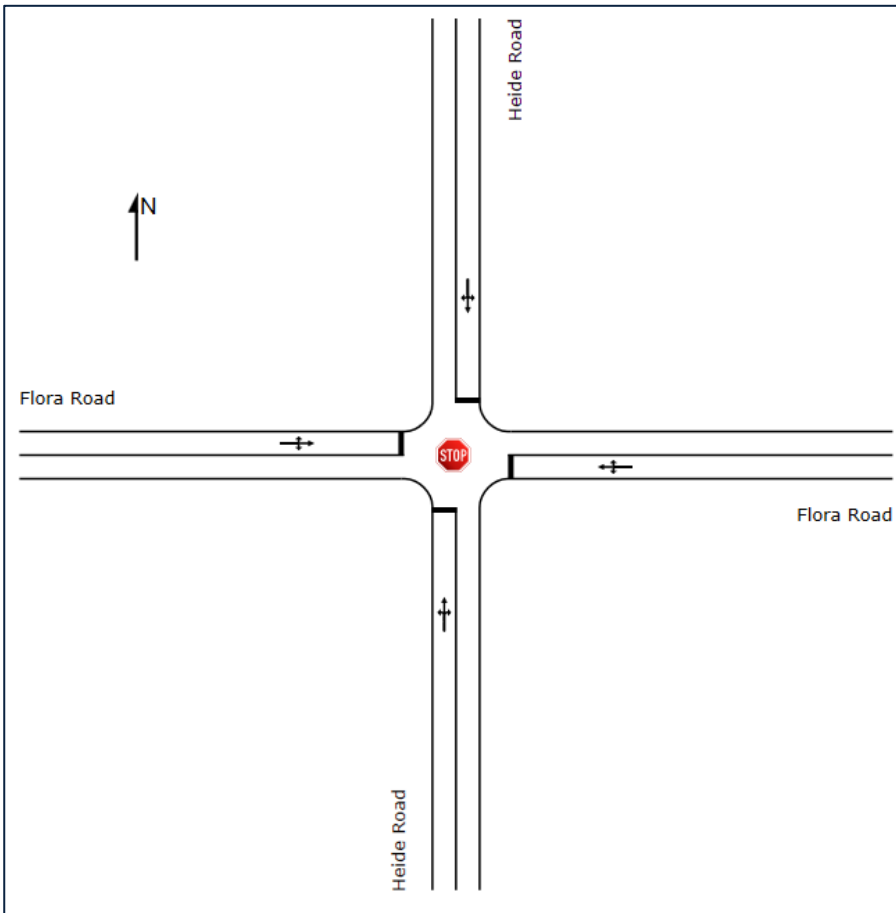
Existing Intersection Layout: Heide Road and Flora Road
